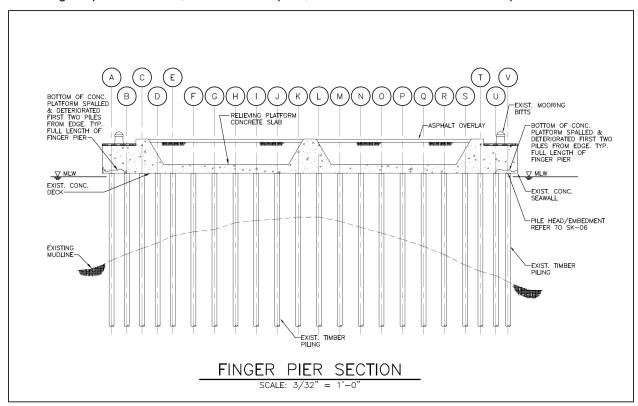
Typical Section - Canton Marine Terminal Pier 13
